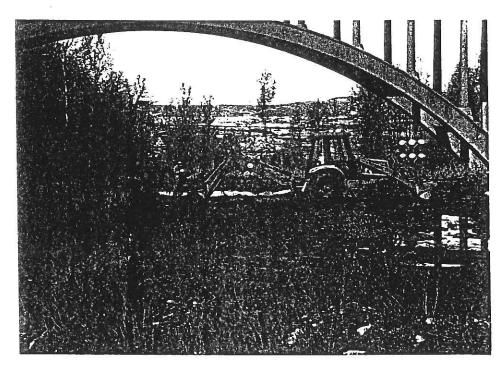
TP9 DUG INTO LOWER BENCH BELOW 34TH STREET BRIDGE
